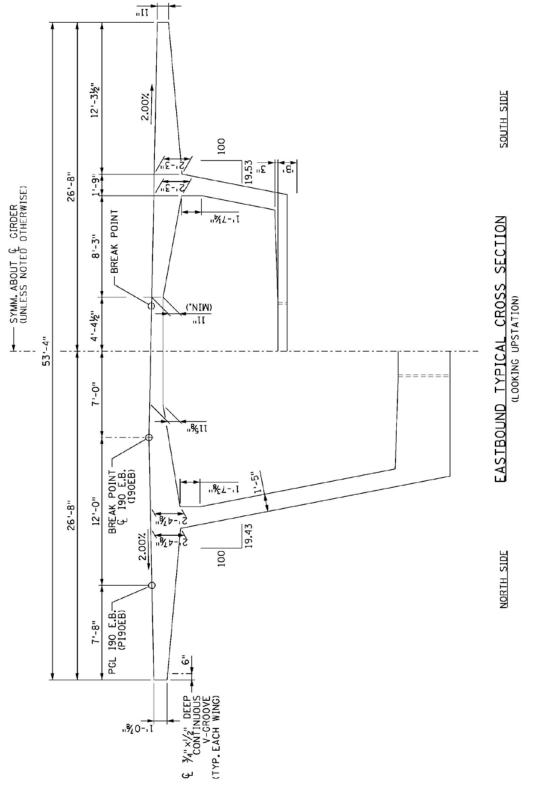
Eastbound Typical Box Girder Cross-Section
